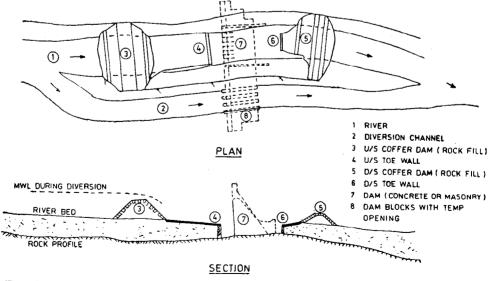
Diversion Channel for Concrete/Masonry Dam in a Narrow River
